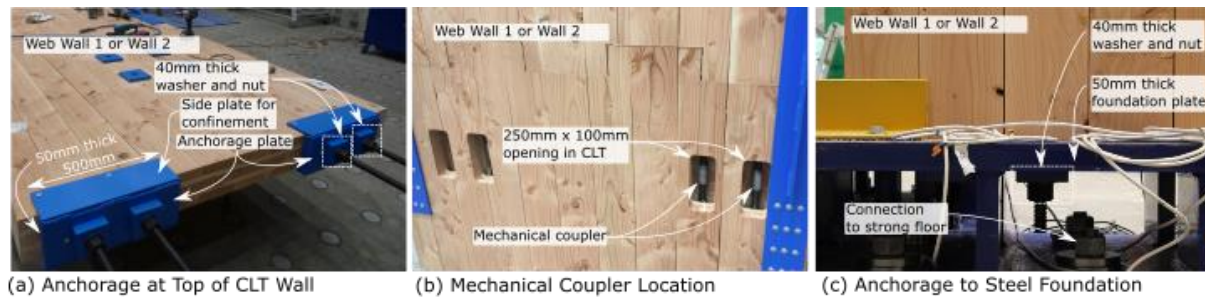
Post-tensioning anchorage details: (a) anchorage at top of CLT wall, (b) mechanical coupler location, and (c) anchorage to steel foundation
